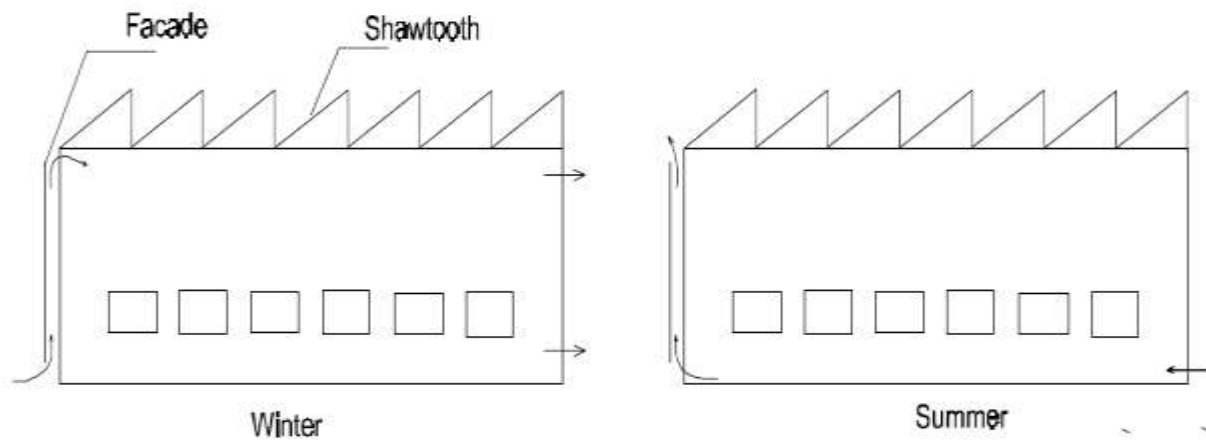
Unglazed PV/T air collector as ventilated PV facade in an industrial building
